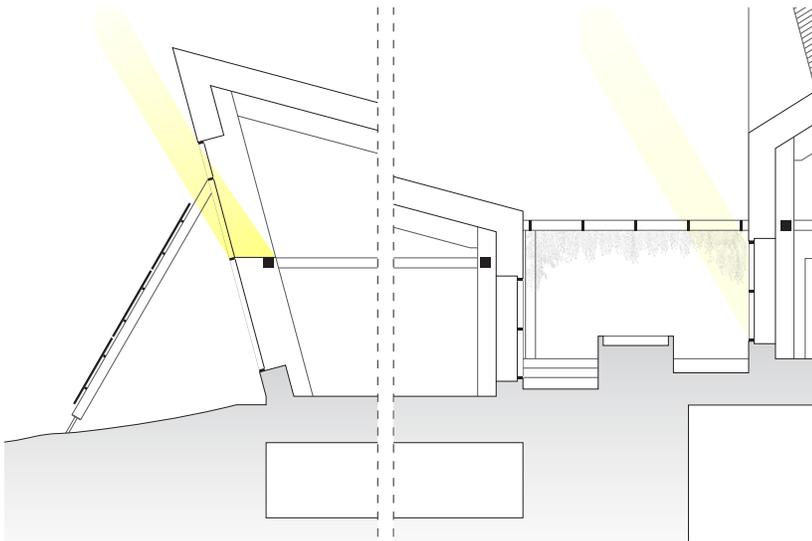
| Section Looking east with winter sun (60°) under Middle of the Road conditions
